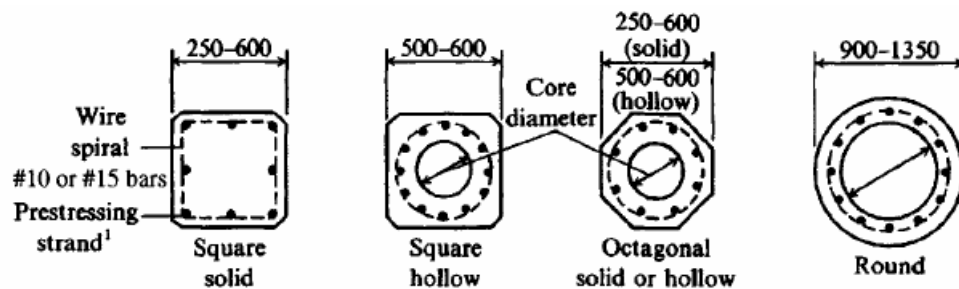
Precast prestressed concrete piles (Foundation analysis and design, 1997)
